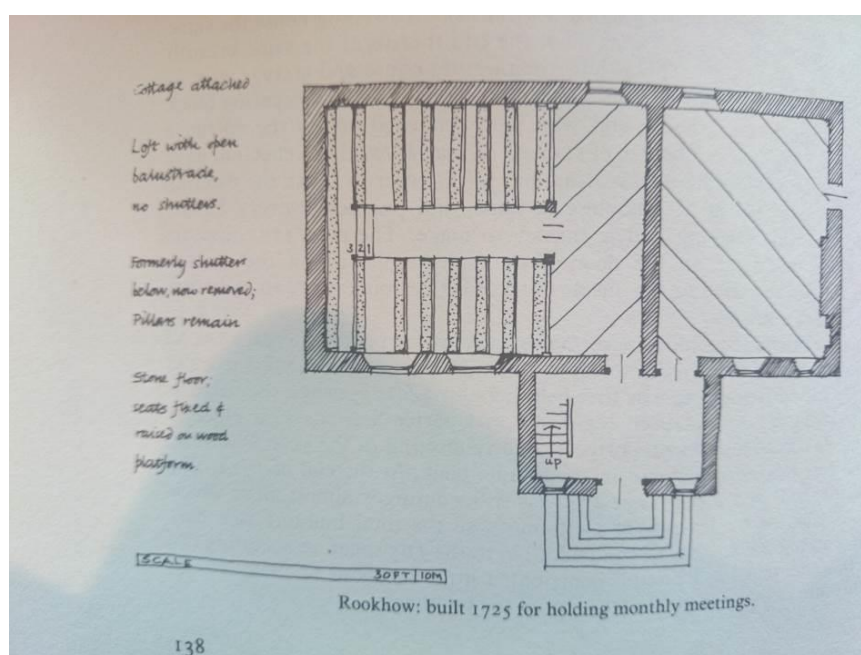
Ground floor plan of the meeting house as reconstructed by Butler (north is to the right; not to scale) (Butler (1978), p.138)
